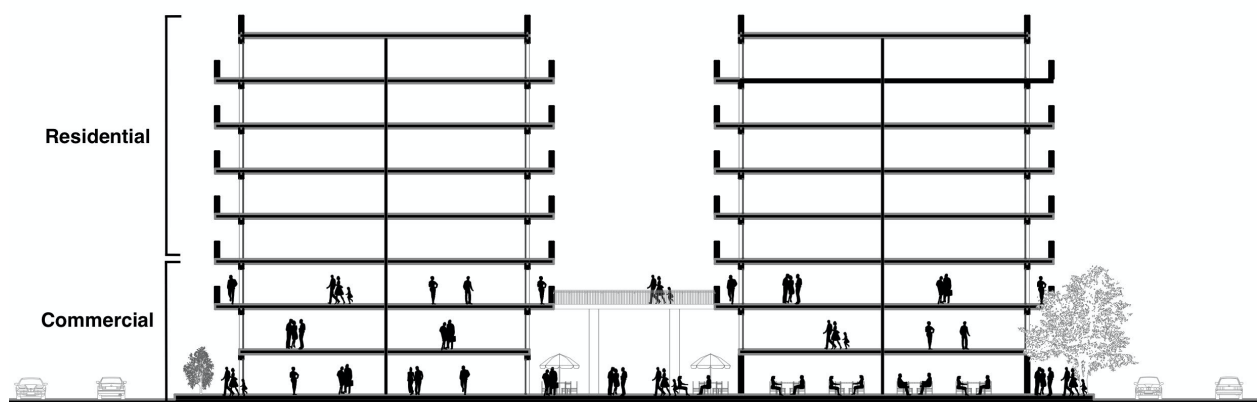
The schematic cross section representing the two buildings: each of them is an eight-story walk-up block, the ground floor and the two following floors are for commercial purpose, and the five upper floors are residential (Source: Author).
